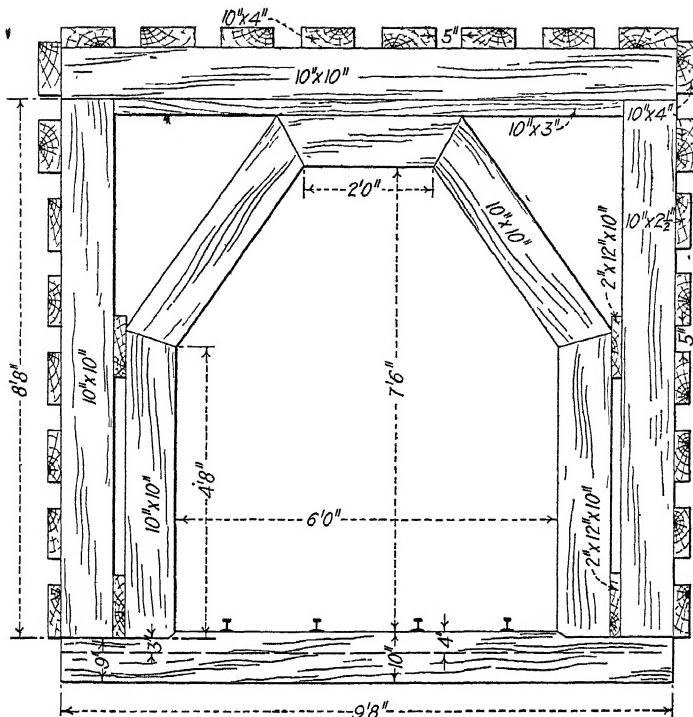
STANDARD DRIFT TIMBERING FOR DOUBLE TRACK, BROKEN HILL PROPRIETARY CO., LTD.
